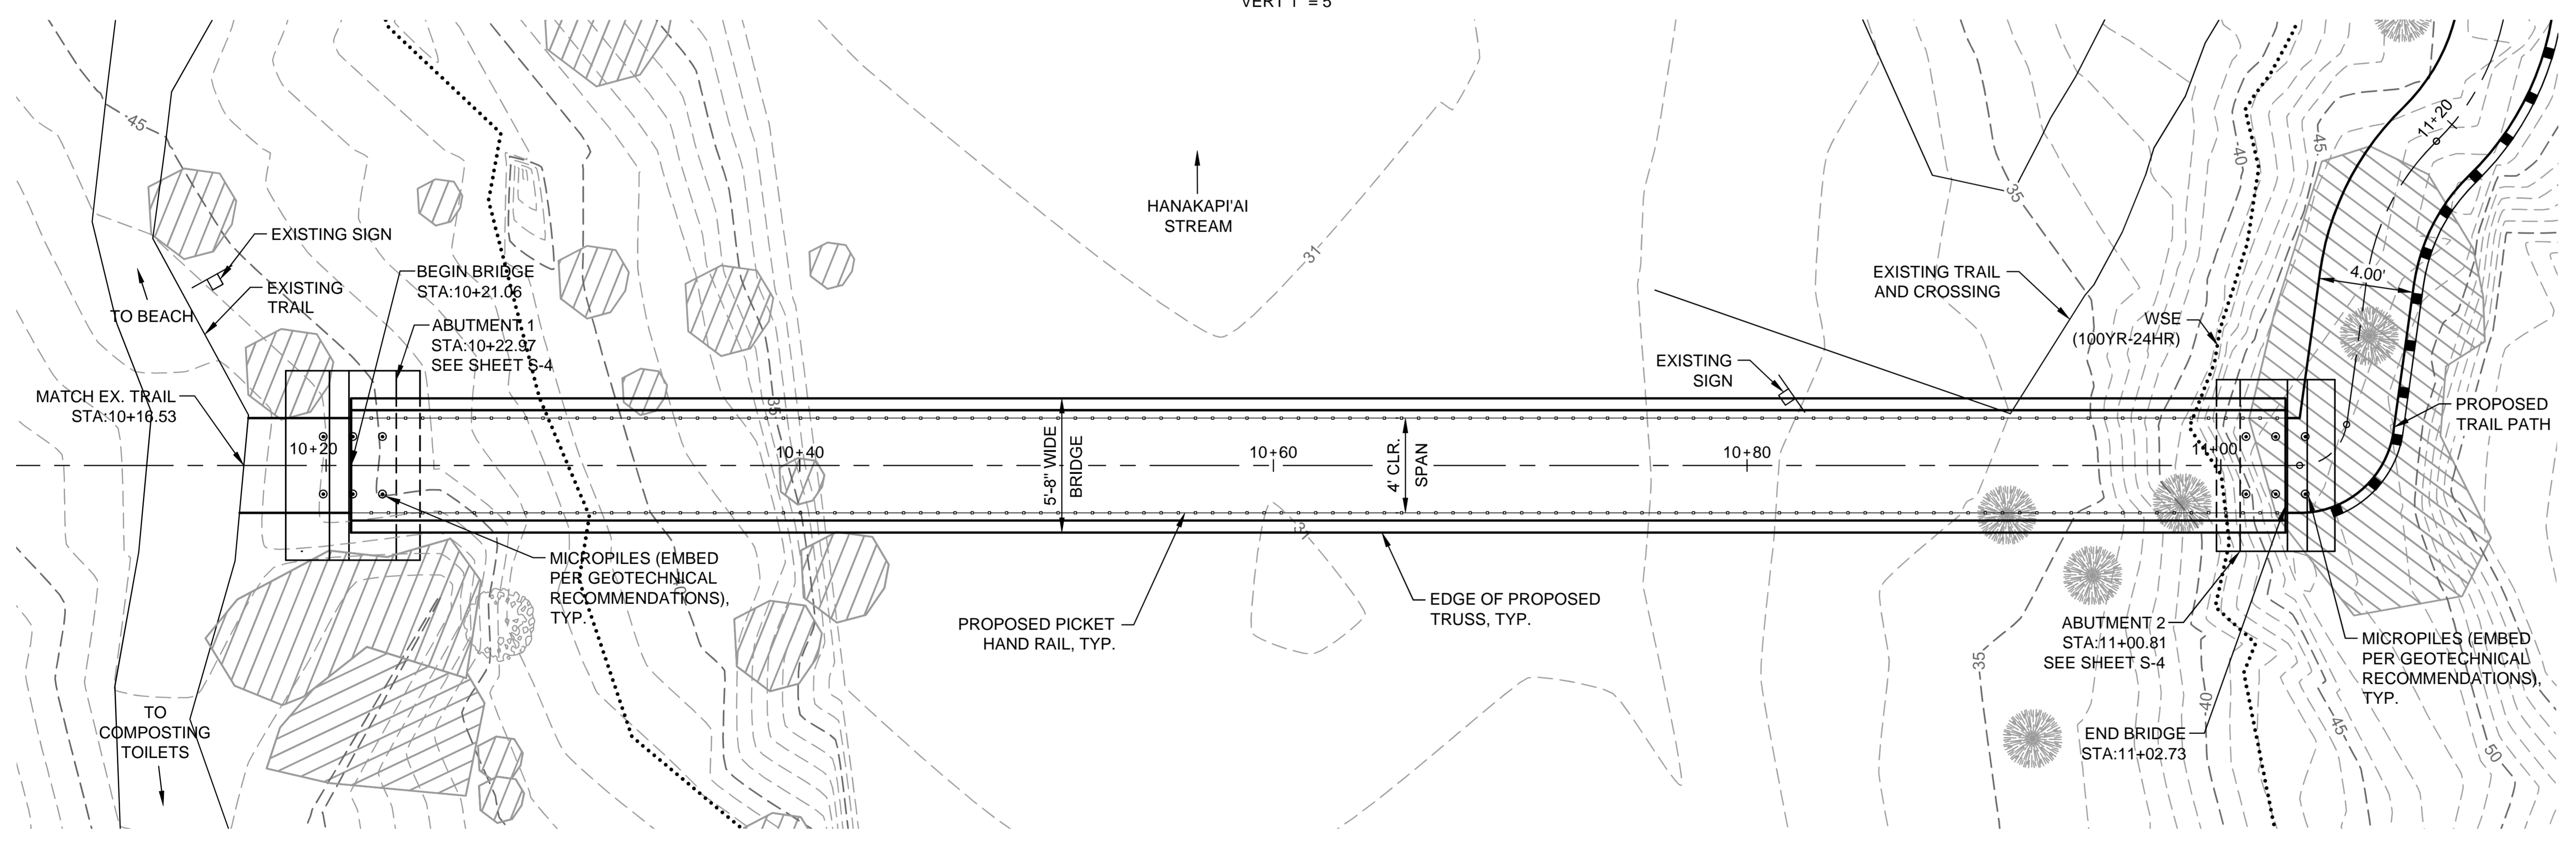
Rendering of approximate proposed bridge structure and alignment.
